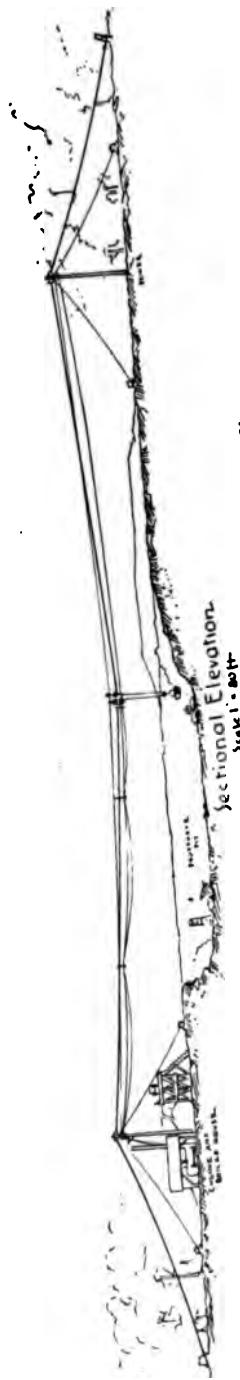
THE LOCKE-MILLER HORIZONTAL CABLEWAY.
